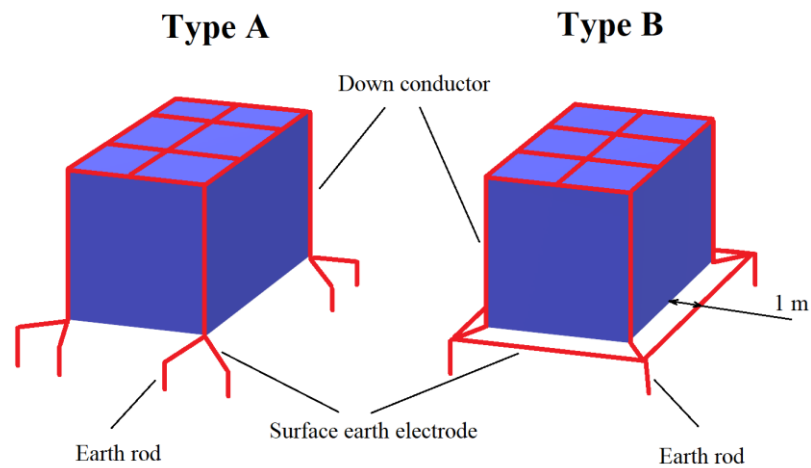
Arrangement of Type A and Type B earth-termination system
